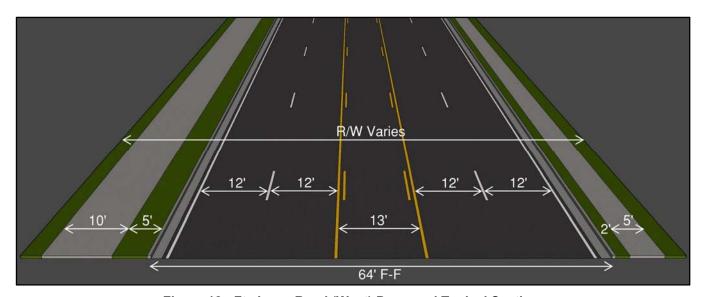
Ft. Jesse Road (West) Proposed Typical Section
